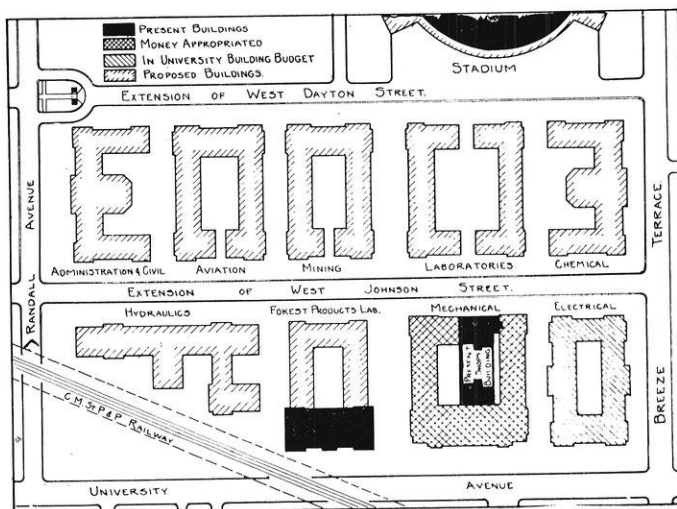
Proposed layout of new engineering buildings at Camp Randall.
